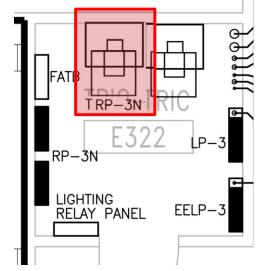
Fourth Floor Electrical Room Transformer Location
